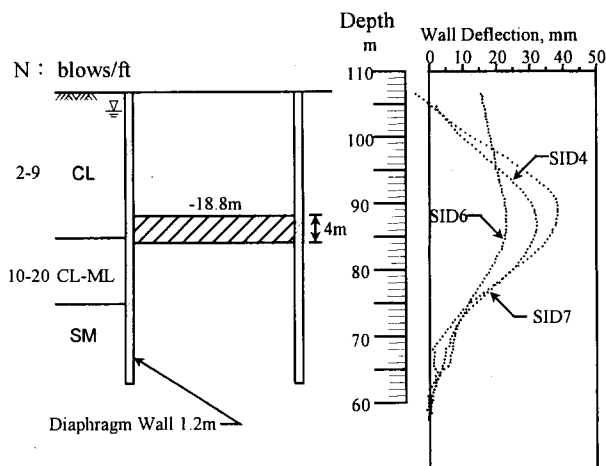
Wall Deflections - Job 7 With Grouted Slab
